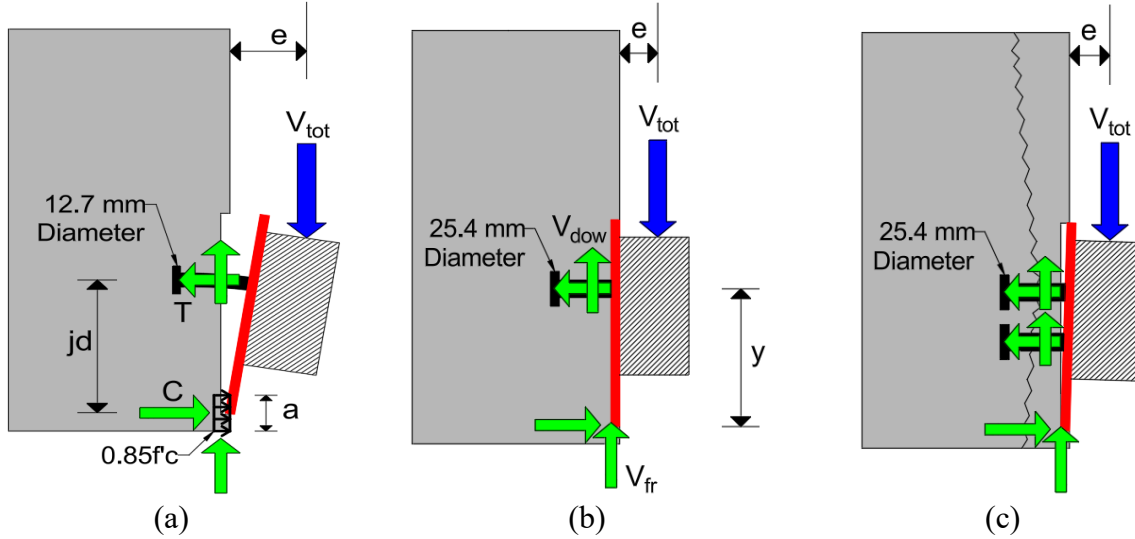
Schematic of experimental failure modes: (a) yield-pullout-tensile fracture mode I; (b) shear stud shear fracture mode II; and (c) concrete cracking-shear stud pullout failure mode III.
